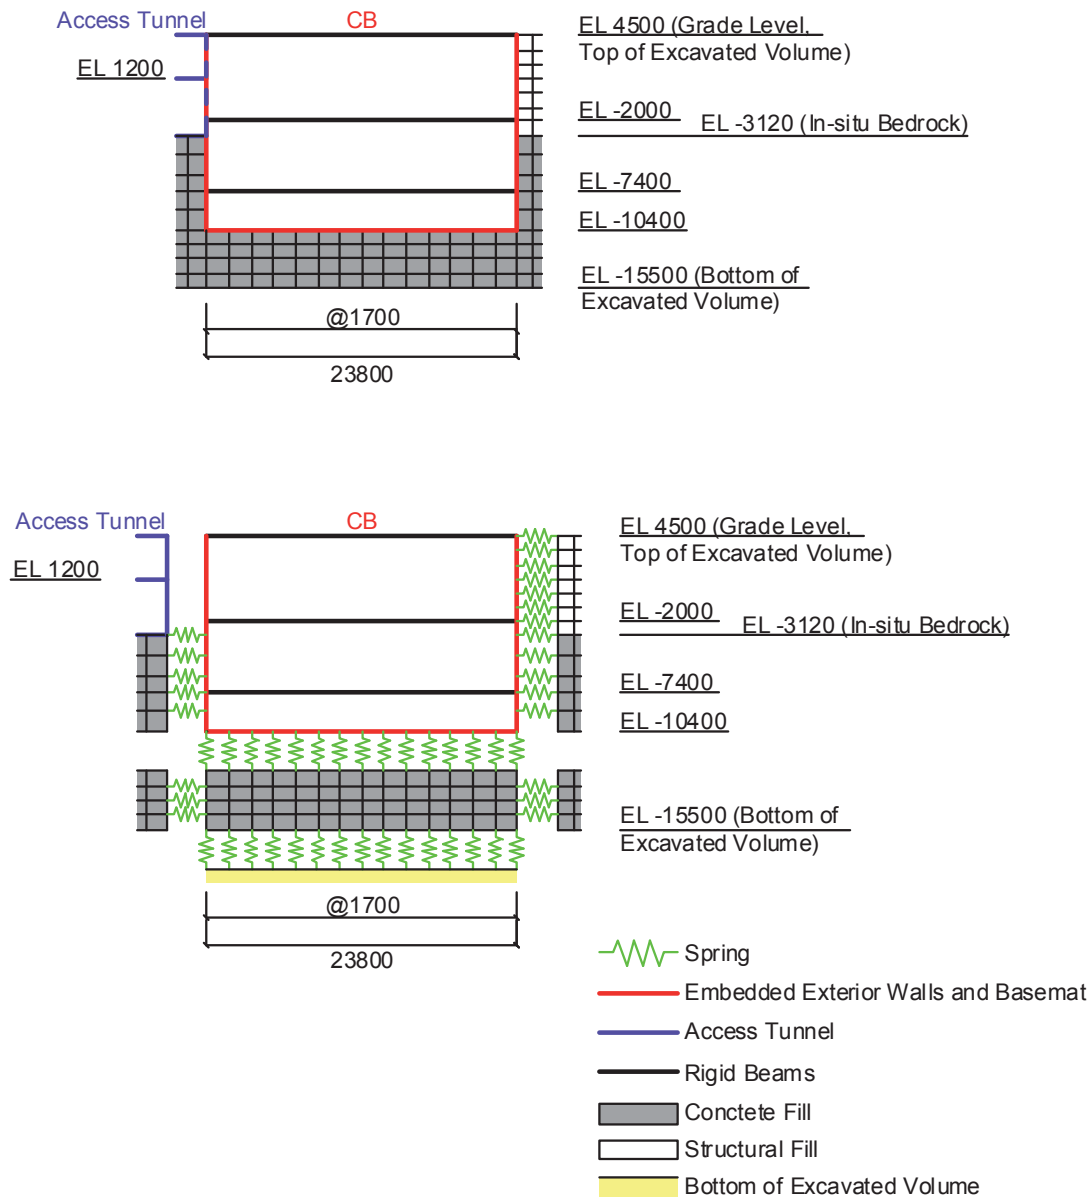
Locations of Spring Elements for CB Exterior Wall/Backfill Interfaces
